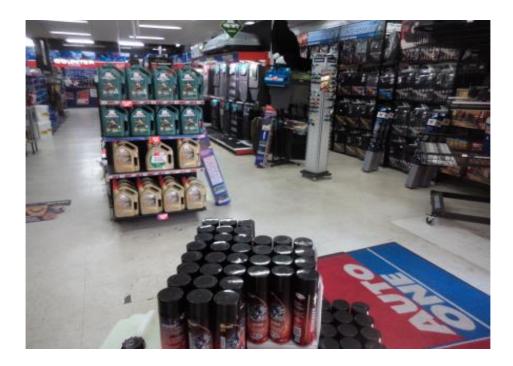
117-119 Internal, ground floor, presumed asbestos floor tiles.
